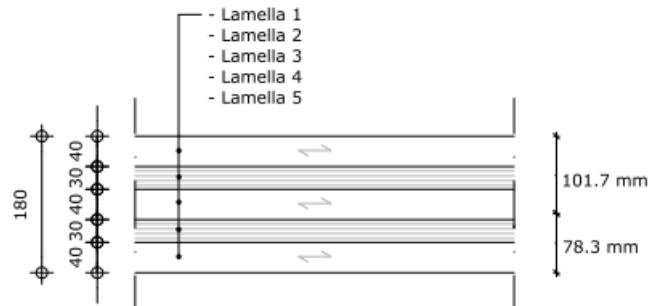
Lay-up for a 180 mm thick CLT bottom sheathing in mm
